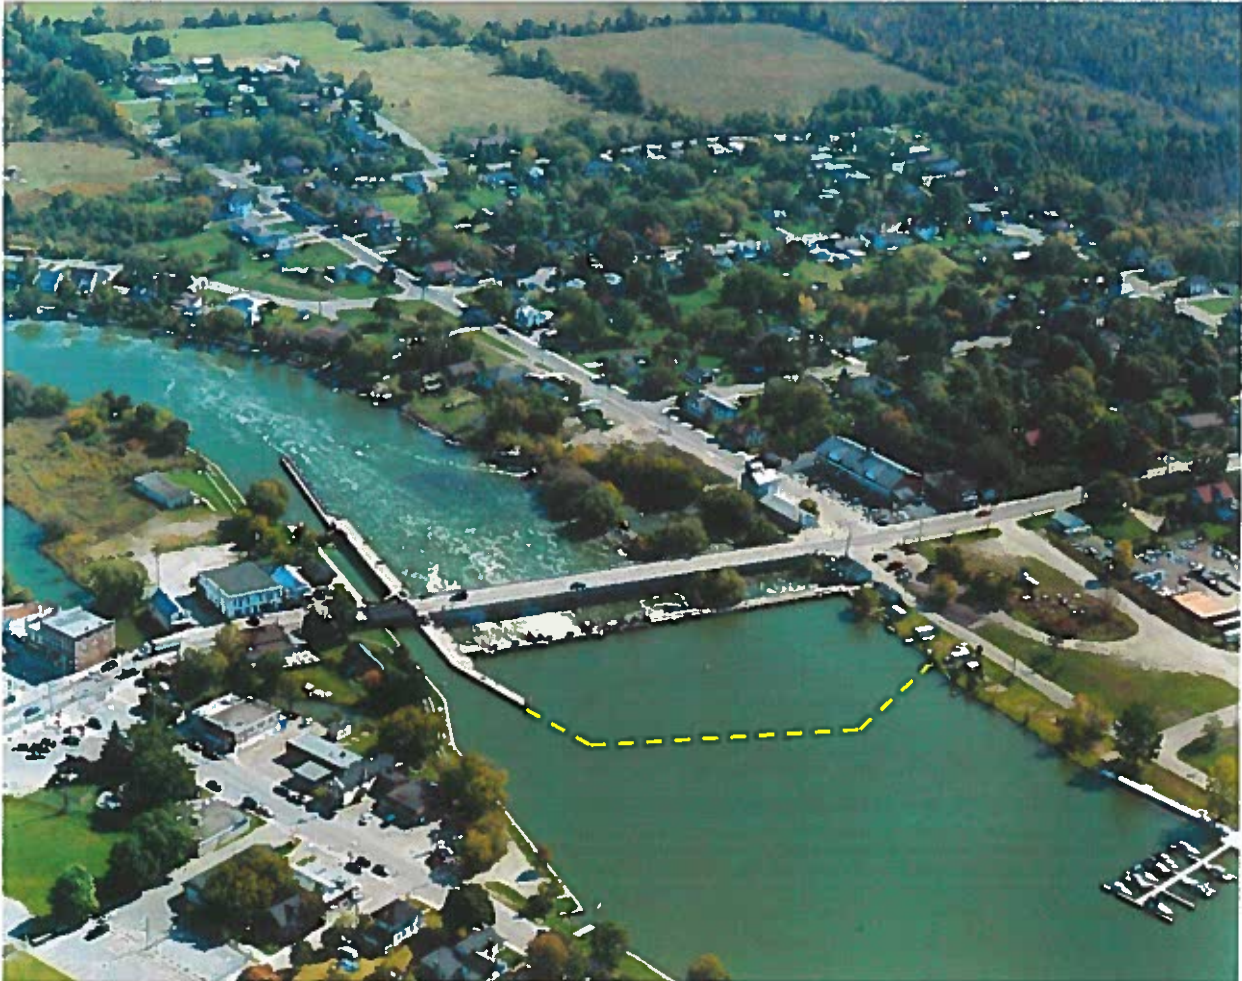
Aerial Photo of Hastings Dam at Lock 18 looking downstream. Dam is to the right of Lock 18. Approximate proposed boom location is shown as yellow dashed line. Intent is to direct watercraft away from dam and towards lock. An inverted v-shape layout is proposed to promote self rescue. The boom is further set back upstream off the end of existing canal cut wall away from dam to protect against draw of main tainter gates. Currently an existing aerial cable exists upstream of dam. It is seen (lightly) in photo between dam and proposed new boom.
